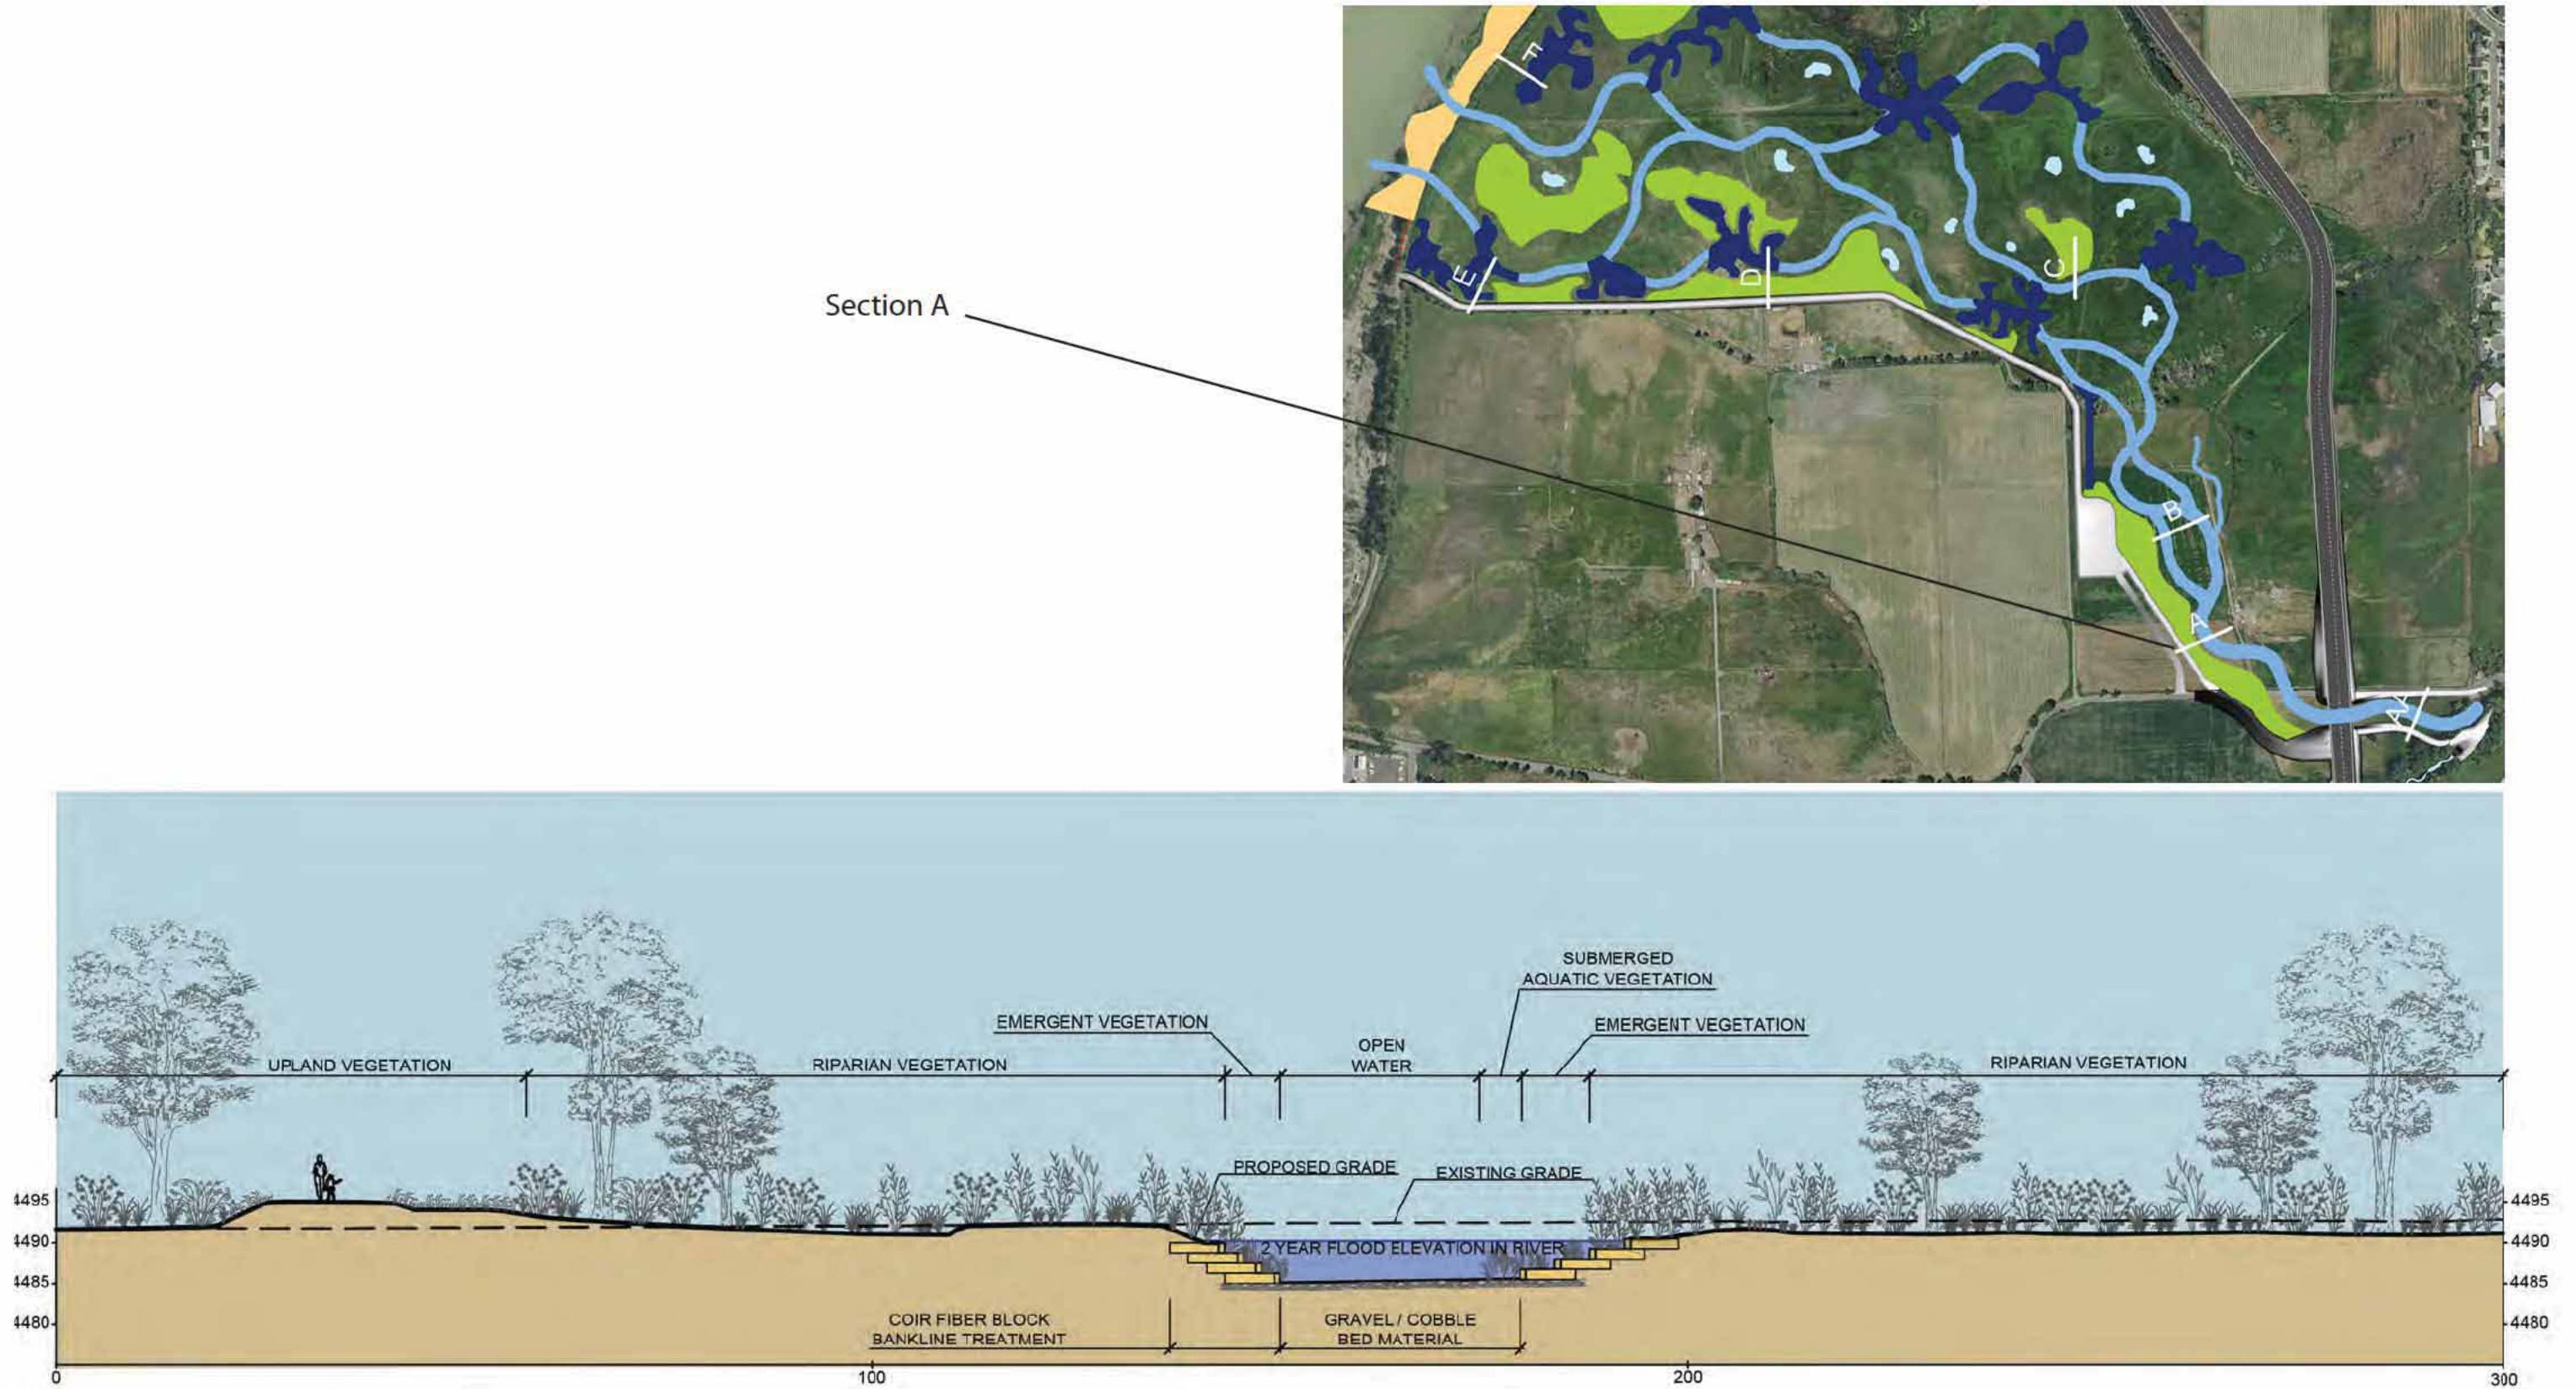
Typical cross-section view of a single threaded section of river channel downstream of the Lakeview Parkway bridge, with coir fabric lifts on channel banks and revegetation zones shown. Additional detail on the coir fabric lifts is included in Appendix B. This illustration is from Appendix A where it is designated as "Cross Section A". Appendix A contains additional details on revegetation.
